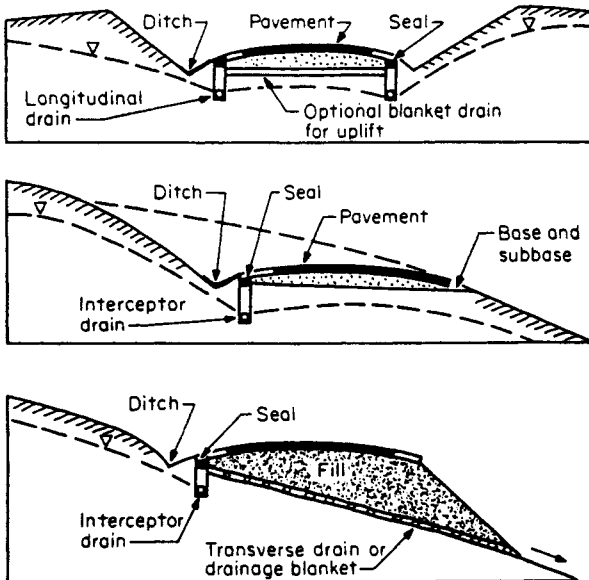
Typical natural ditch for drainage. (From Hunt, 1984.)
